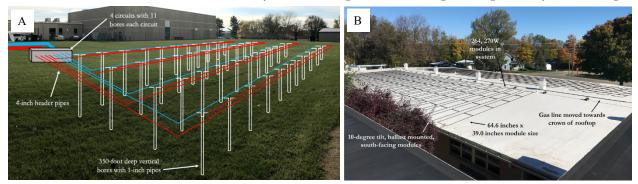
Schematic of final design A) geothermal system (facing southeast) and B) solar system (facing northeast).
